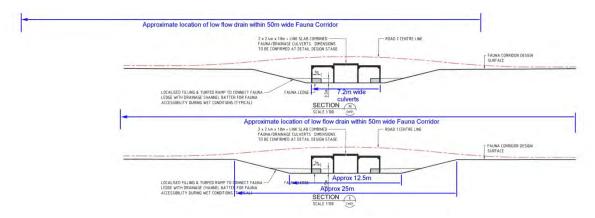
Applicant's fauna crossing plan submitted Jan 2014 (Part of Plan No YC0229-11E1-FC01 Revision E) with blue notation added for clarity by Council
